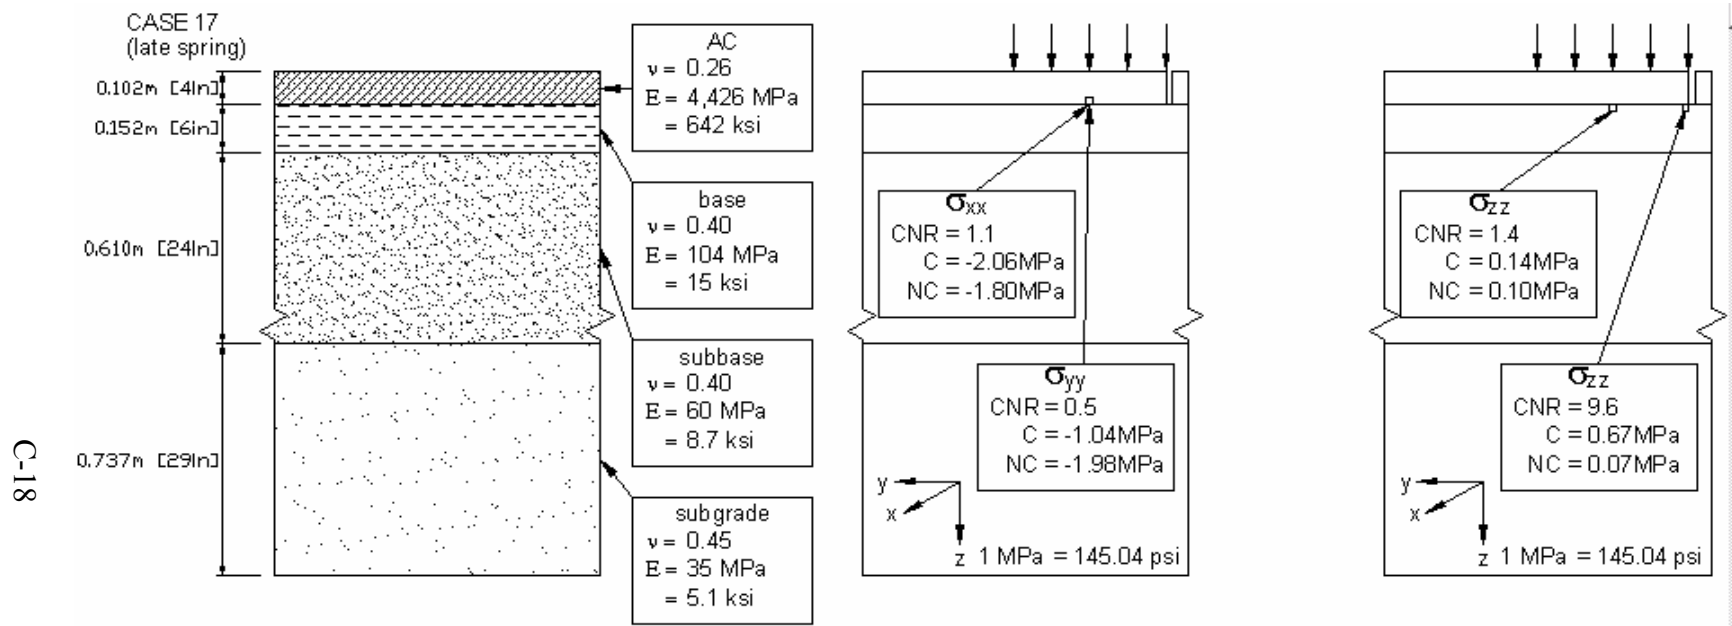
Summary cross section for case 17, (C – stress in cracked pavement, NC – stress in pavement with no crack, CNR – crack/no crack (stress) ratio)
